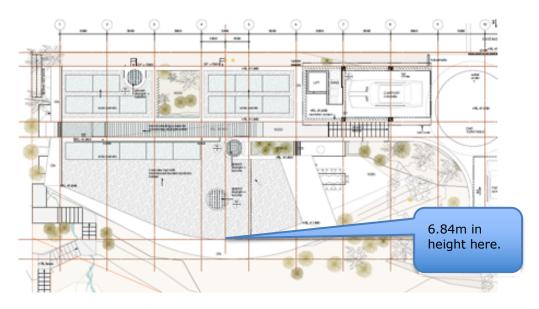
Extract from Drawing DA103, Level 3 Plan of the roof showing the highest part of the roof above the existing ground level.
